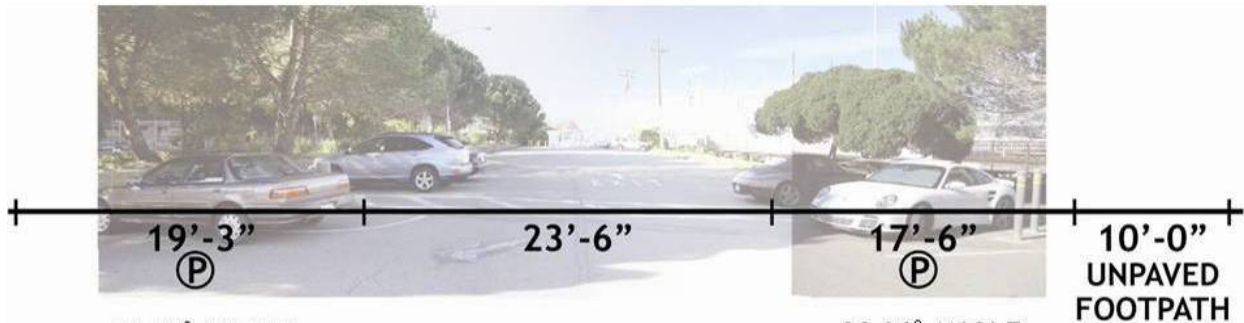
Segment 1D Parking Lot 3 North Existing Conditions
